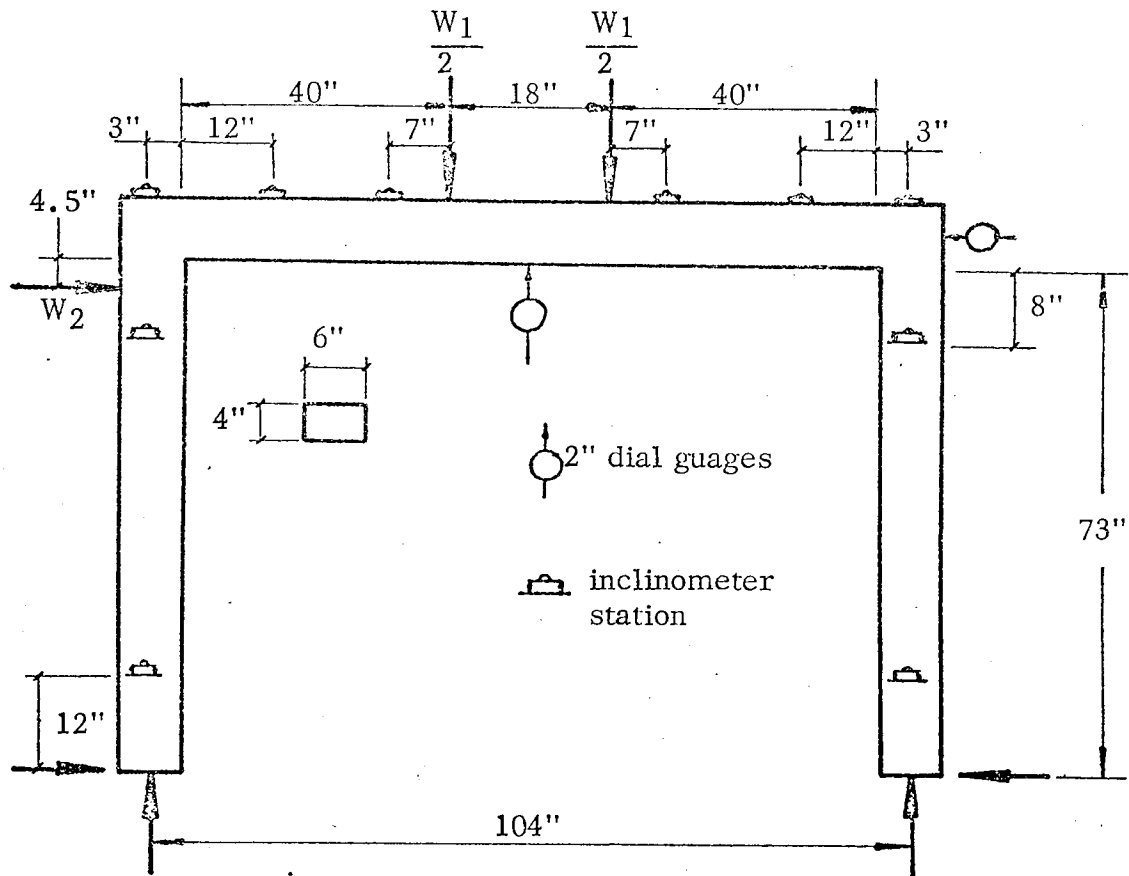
Typical Arrangement of a Reinforced Concrete Portal Frame Test by Cranston.
